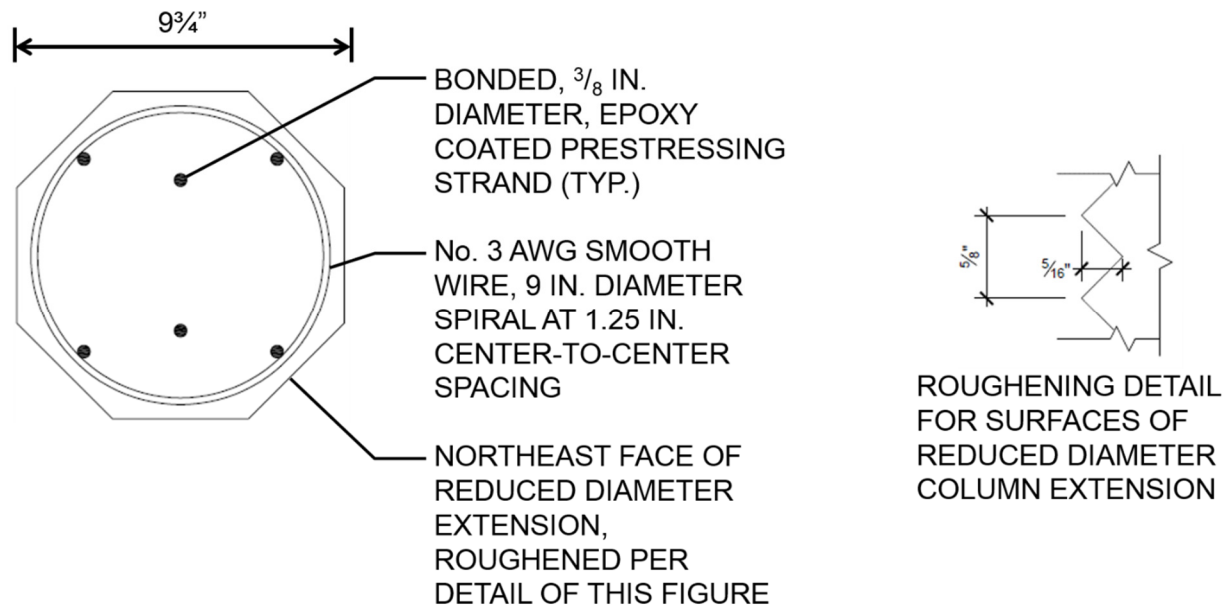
Cross-section of reduced diameter column extension and roughening detail.
